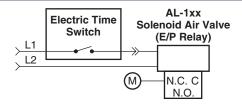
Typical Application Wiring Diagram. (Air-Handling Unit Application)
